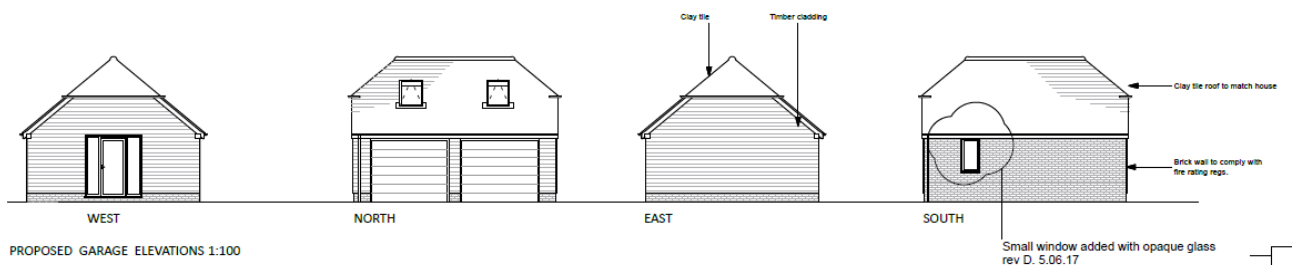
Latest approved elevations for garage building (17/01646/HOUSE)
